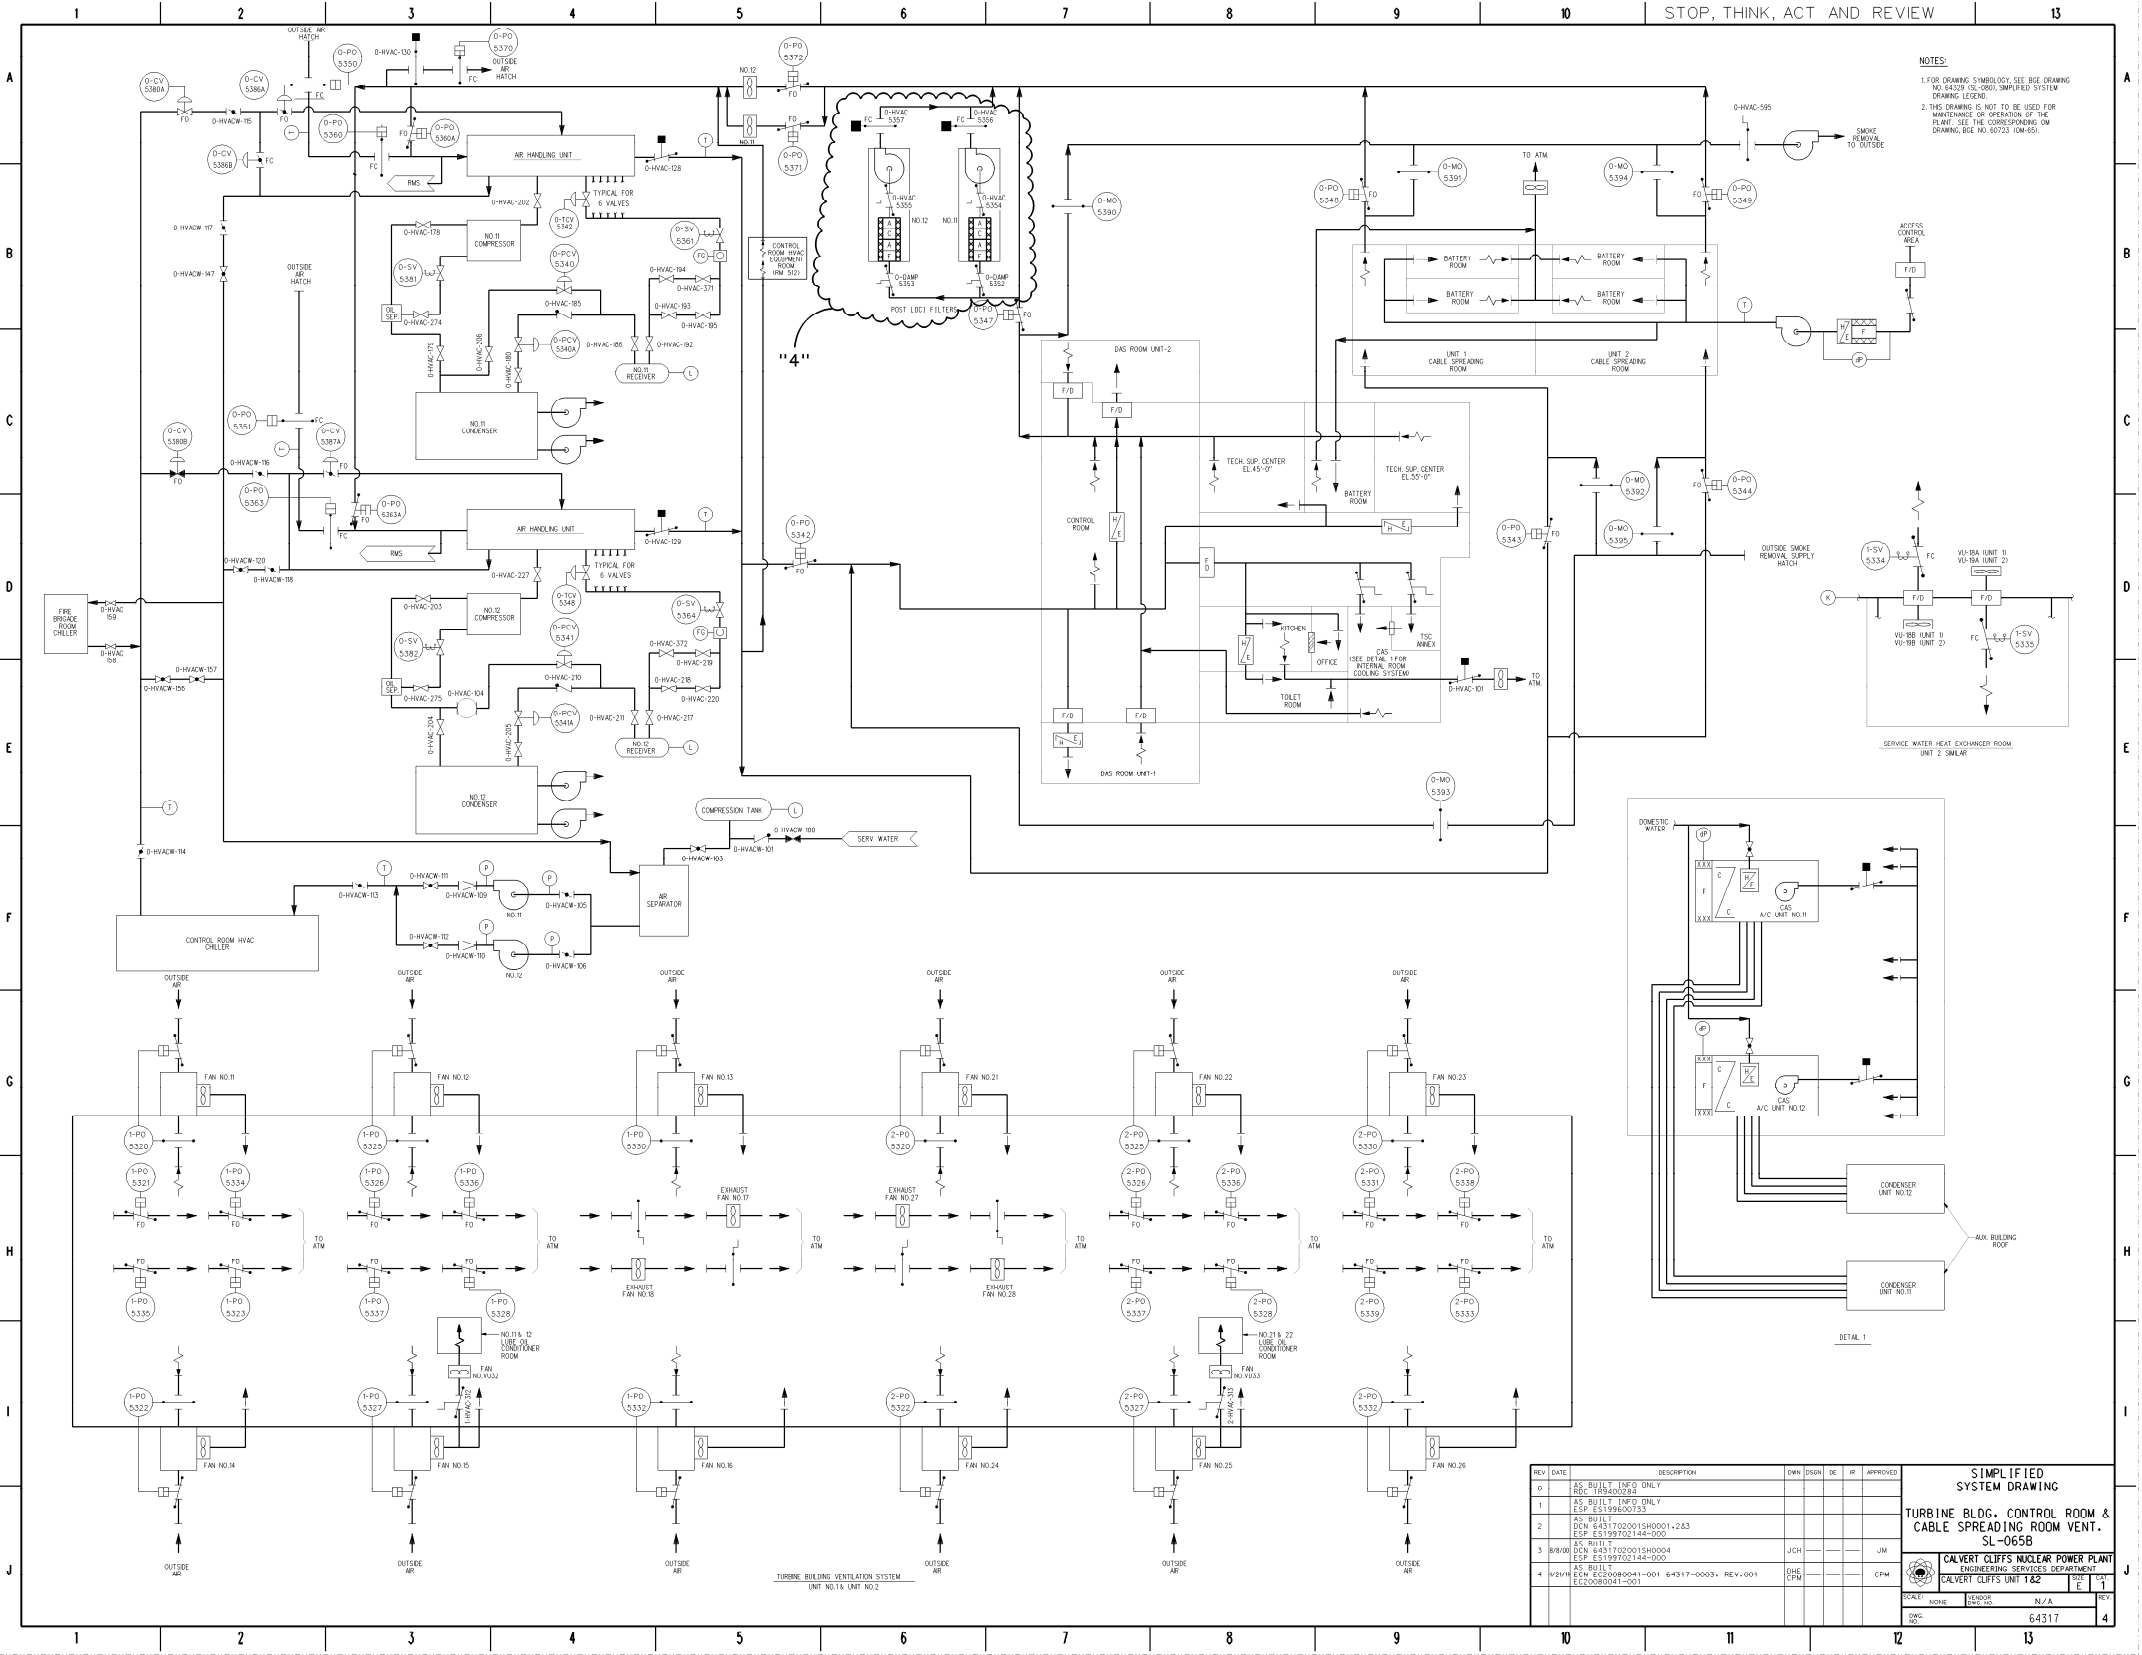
B TURBINE BUILDING, CONTROL ROOM, AND CABLE SPREADING ROOM VENTILATION
